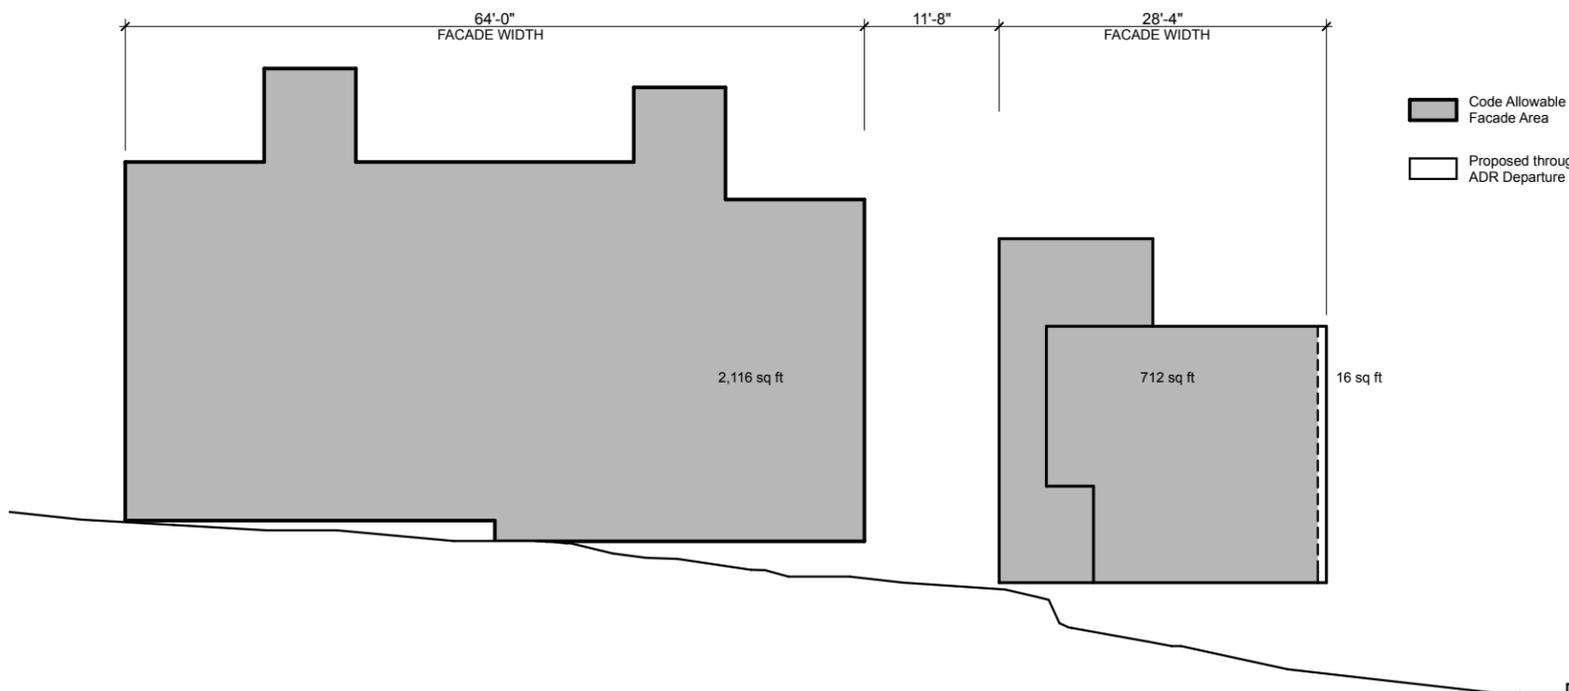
South Elevation View demonstrates wall area related to Façade Length.
